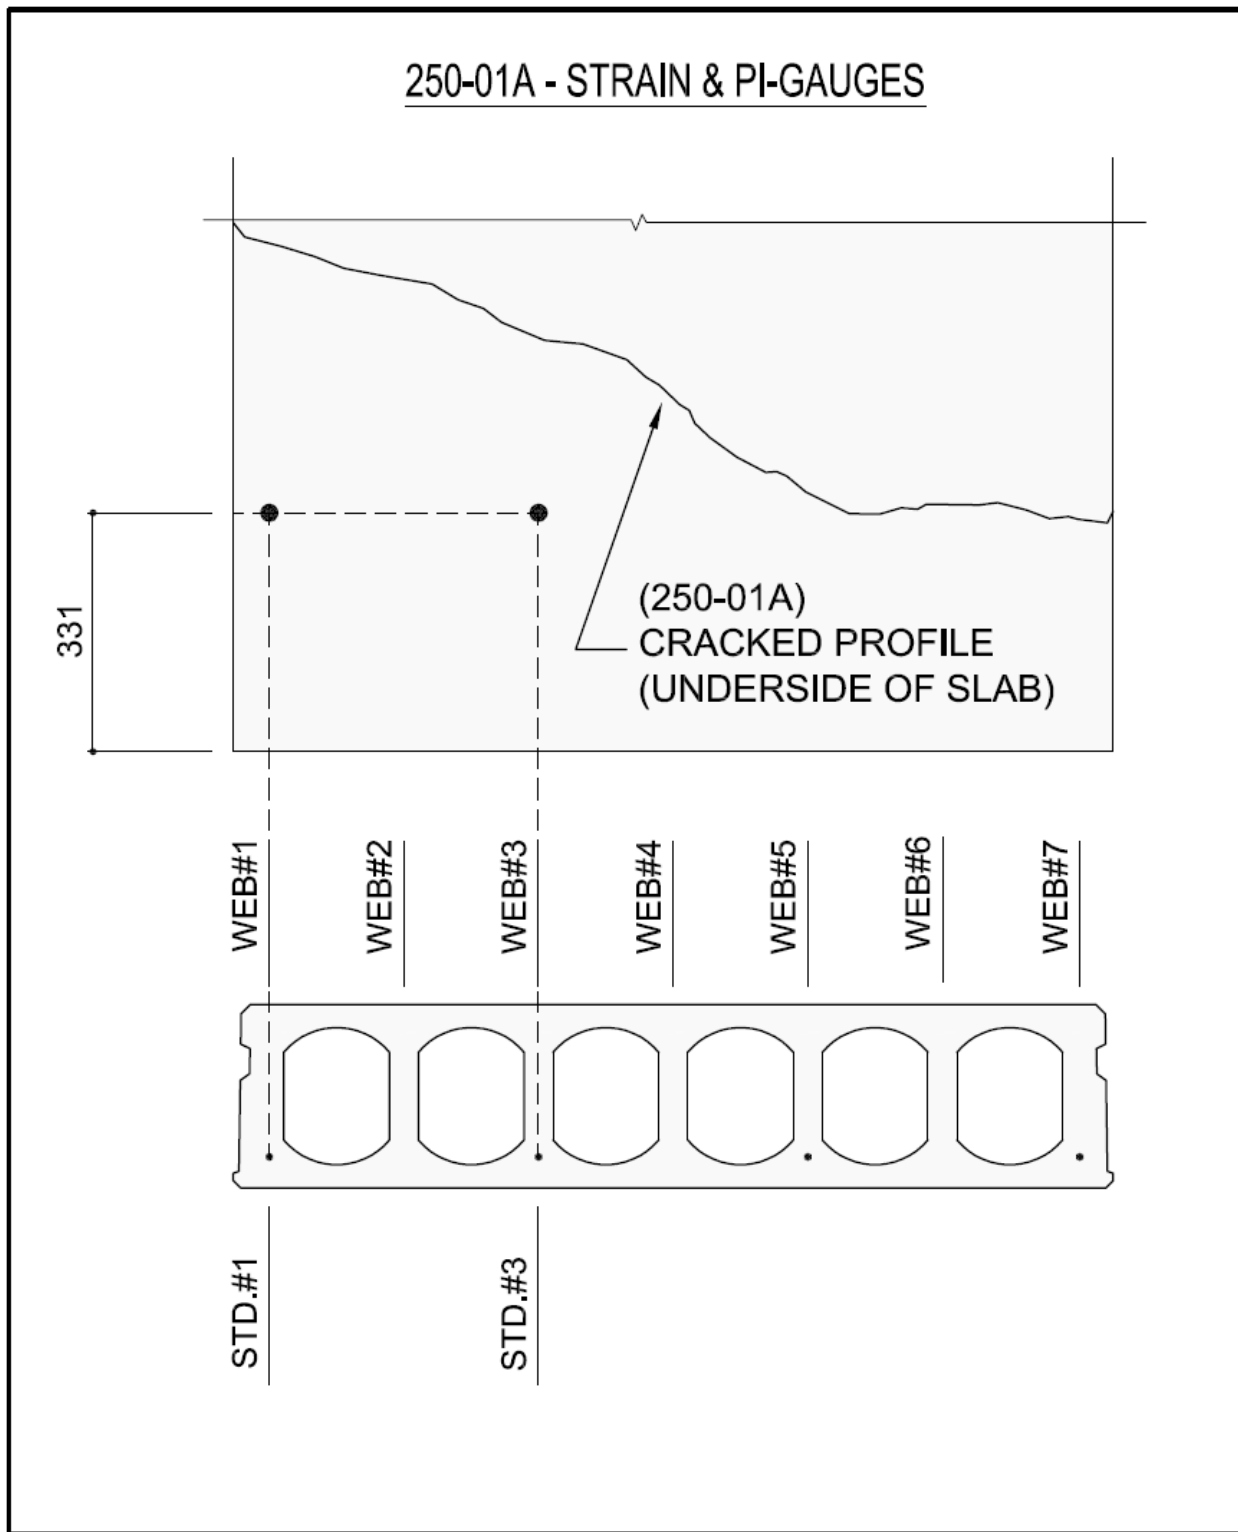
Plan View of Gauges and Crack Profile at Slab Underside (Slab 250-01A)
